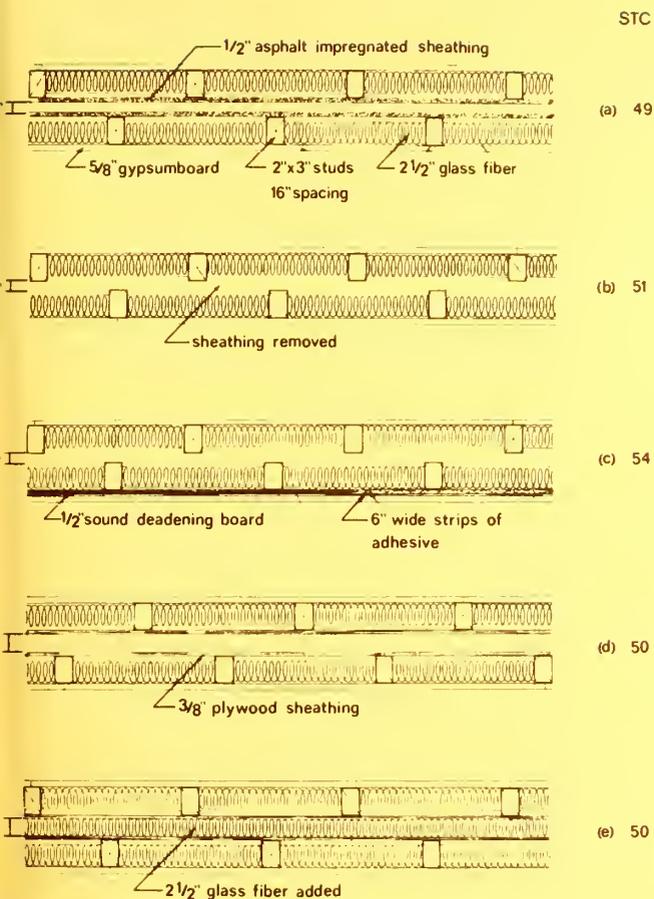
Construction of the wall as formed in the field (a) and as modified in four ways for laboratory testing (b, c, d, e).
